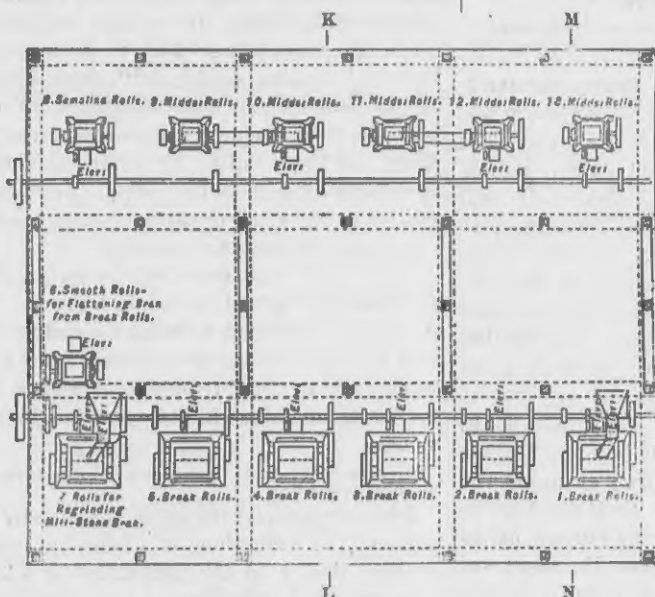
CARTER'S EXHIBITION PLANT.—Plan Ground Floor.
